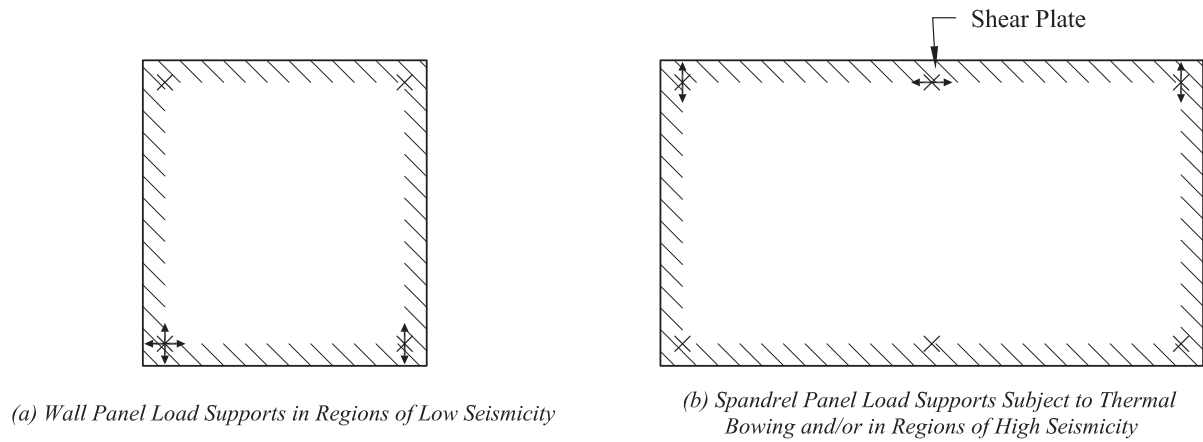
Typical precast panel bearing and tie-back connections layout.
